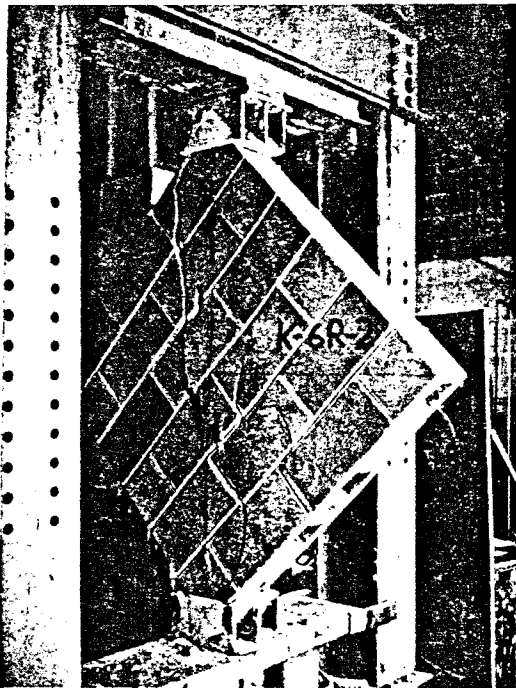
Racking Test at failure. Specimen conventionally constructed (without Korfil Inserts) and Reinforced with 1 #6 at 24" on center.
